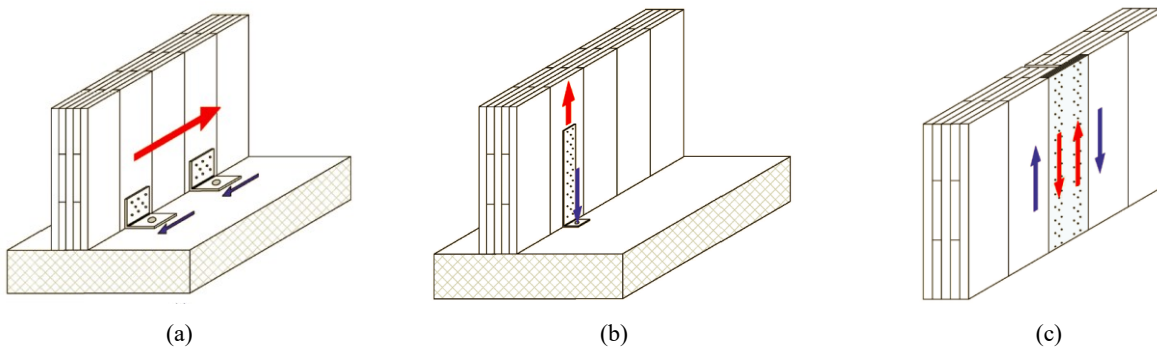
Traditional connections for CLT structures: (a) angle brackets loaded in shear; (b) hold-down loaded in tension; (c) panel-to-panel vertical joint loaded in shear. [2.42]
